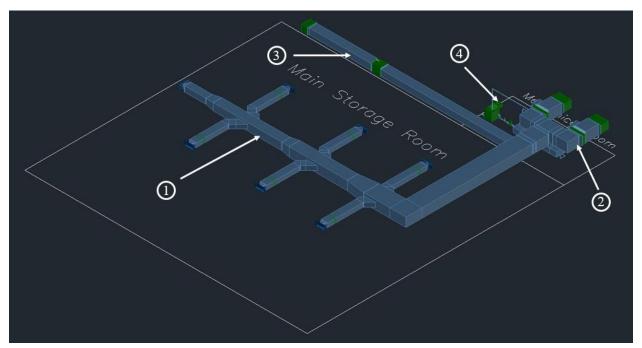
Overall HVAC layout - isometric view. 1 = storage room duct network, 2 = intake duct detail, 3 = return air line, 4 = heating water loop
